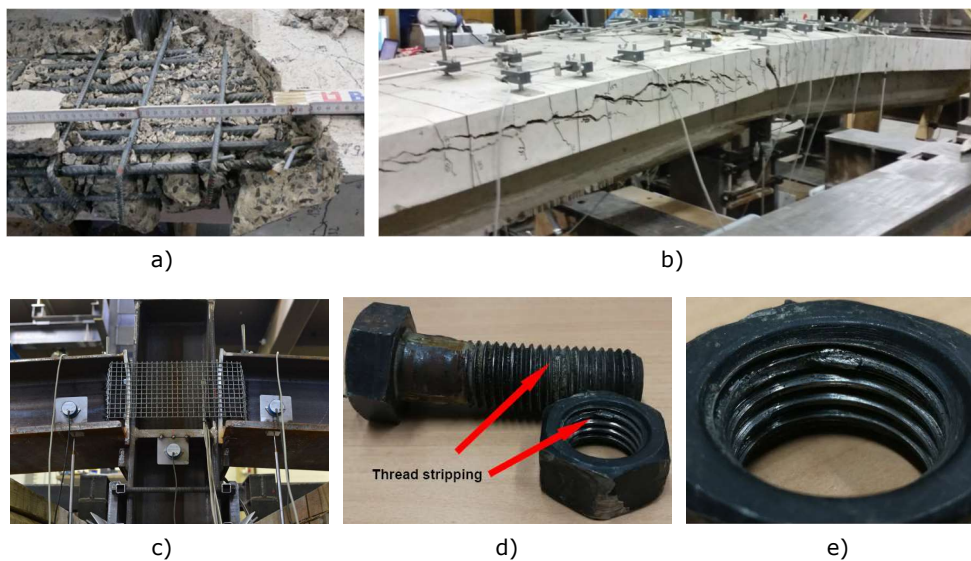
Failure modes. "Series B": a) longitudinal reinforcement failure; b) failure of the concrete slab; "Series C": c) large deformation of the end-plates; d) & e) thread stripping
